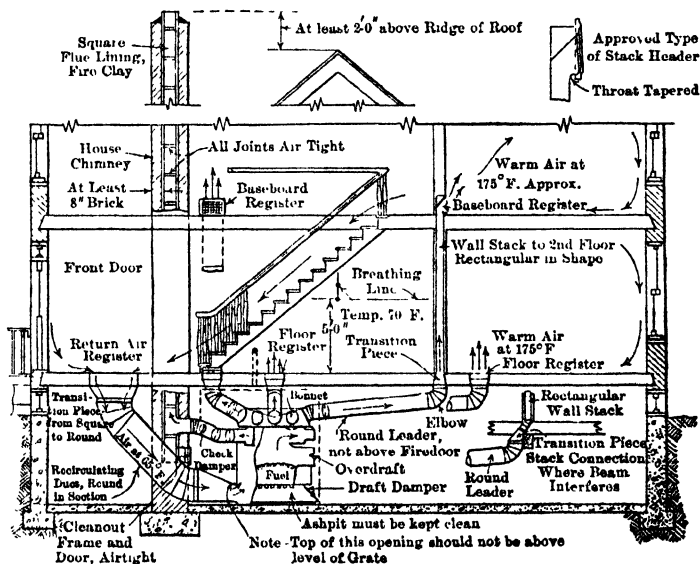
Section through a Residence Showing Details of a Warm-air Heating System (See Fig. 63 for plan)
